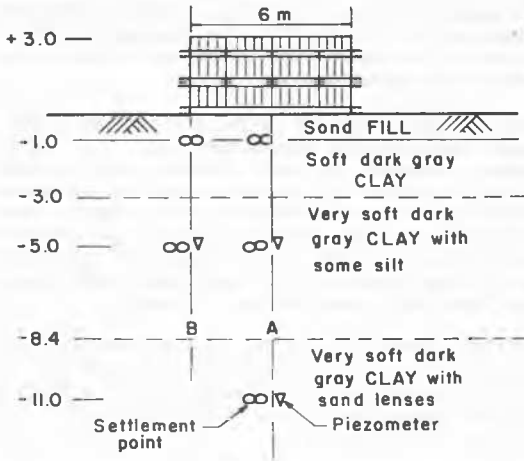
TEST EMBANKMENT AT THA CHANG BRIDGE
